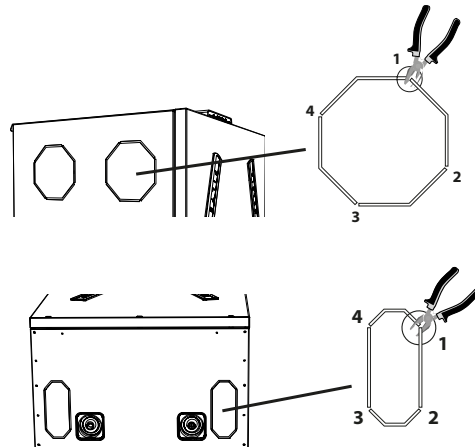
Opening the air duct connections: side connection (top figure) and bottom connection (bottom figure)
